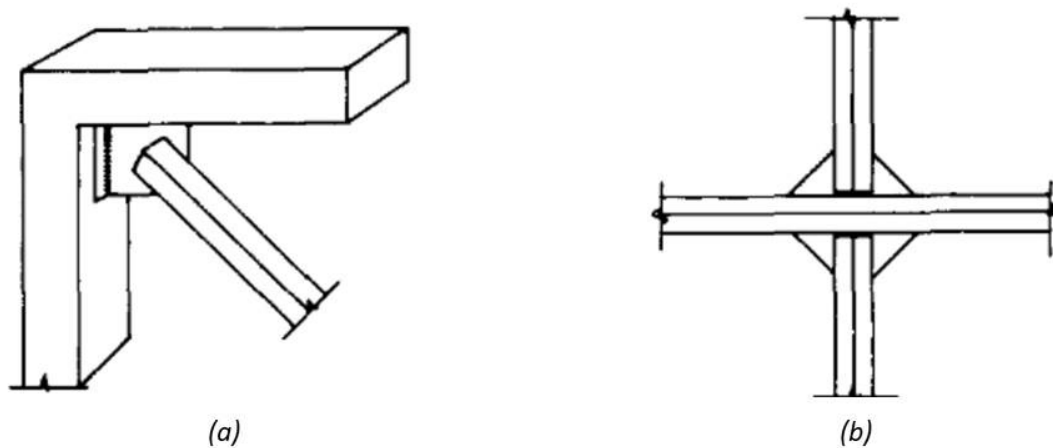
Bracing details: (a) frame to brace connection; and (b) diagonal brace to brace connection
